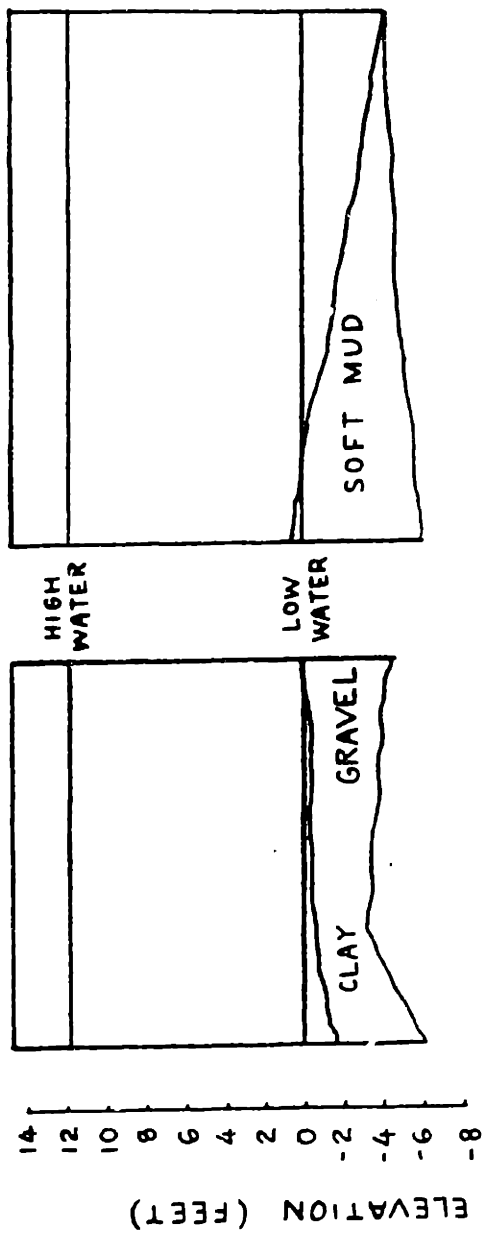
Prefill Cross-sections of South Boston Flats (Parrott, George B., 1849)
